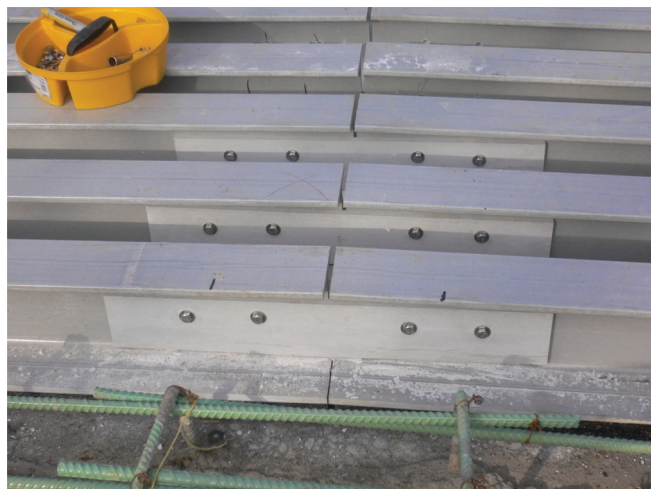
Splice Plates at the Crown Connection (Abutment Reinforcement in Foreground)
